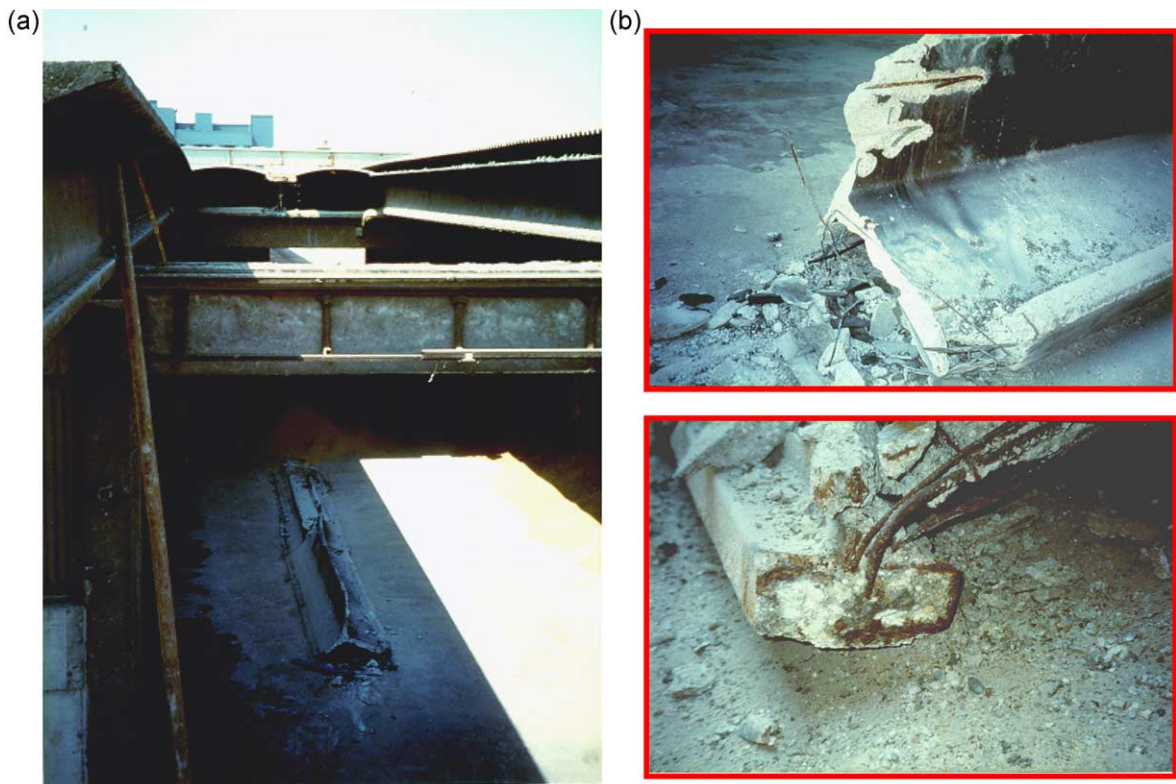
(a) Collapsed prestressed concrete beam (b) Critical section of beam.
